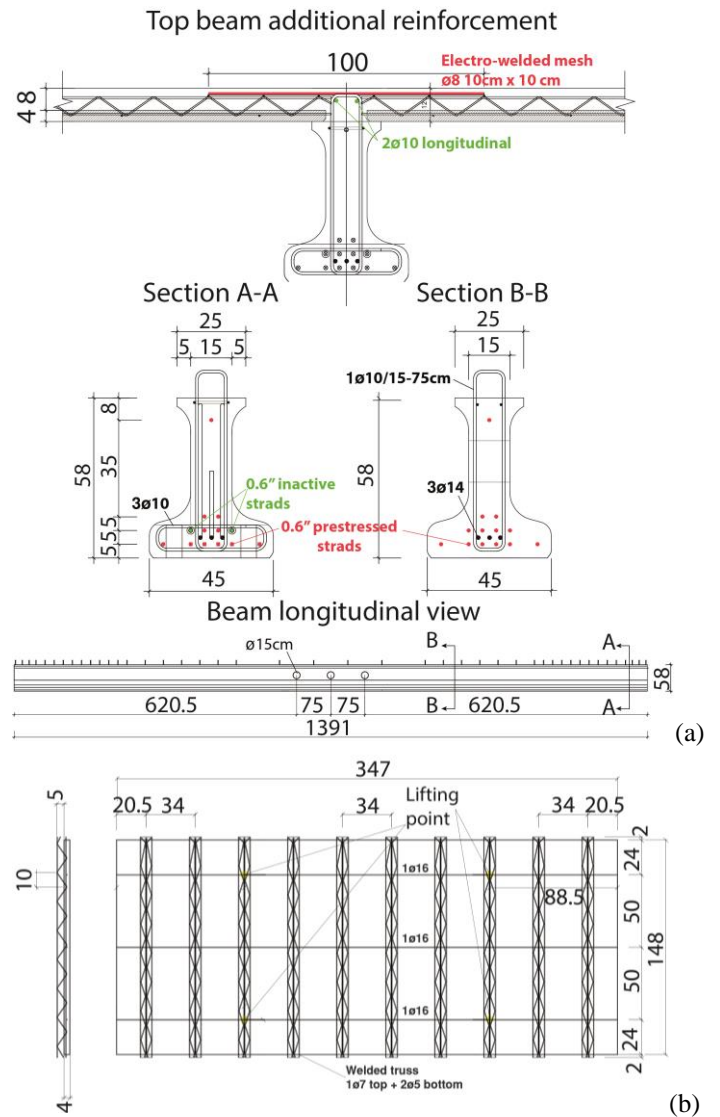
Industrial deck: elevated, partially prefabricated slabs for production zone: (a) plan view; (b) reinforcement adopted. / Impalcato industriale: piastre di solaio parzialmente prefabbricate per la zona produttiva: vista in pianta; (b) schema d'armatura.
